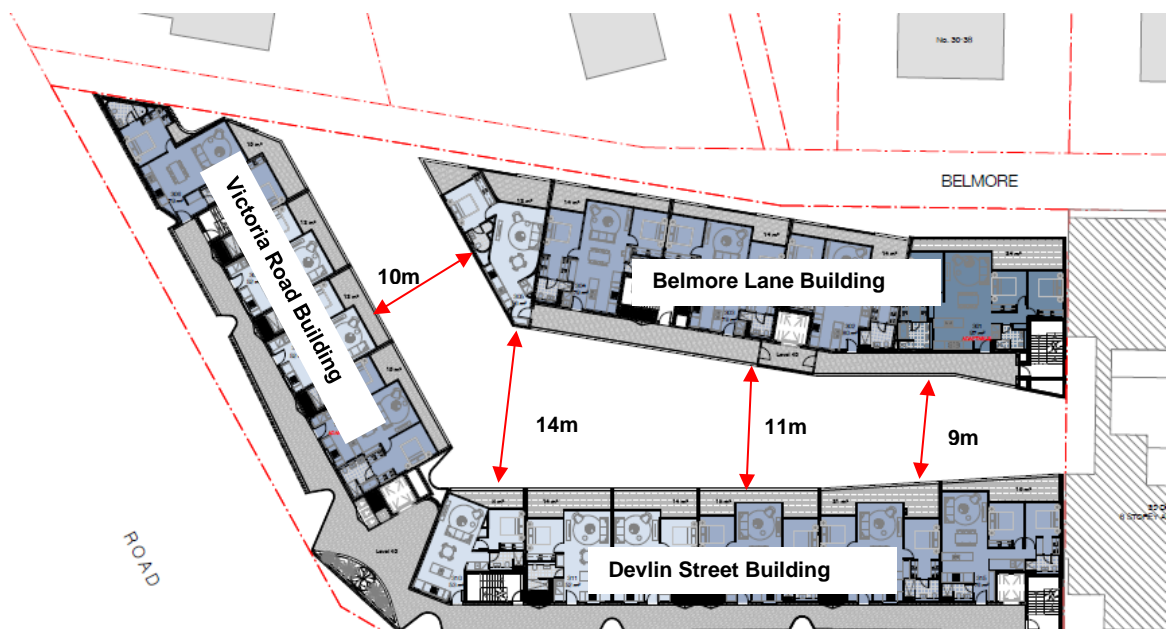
Internal separation distance between proposed buildings (eg. Level 3 – DA-0206)
